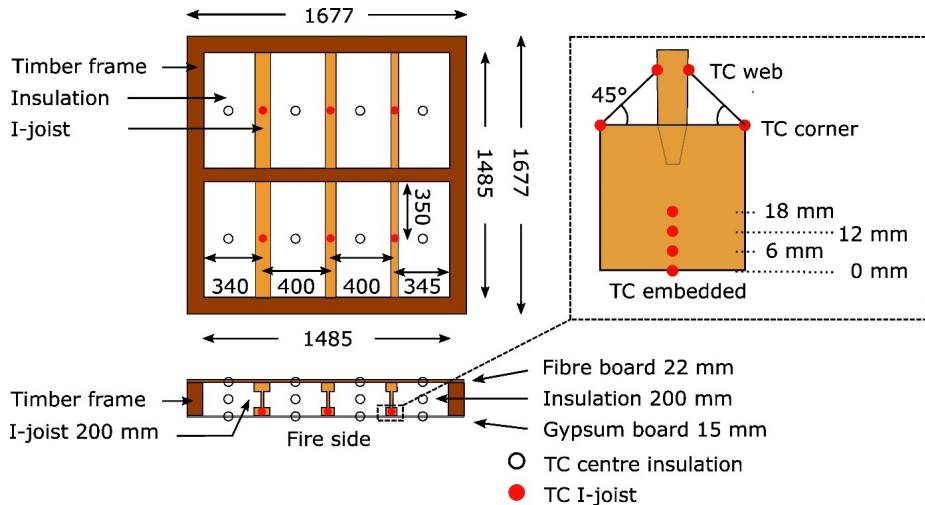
Build-up of test specimen in plan and cross-section, and position of thermocouples. Dimensions in mm.
